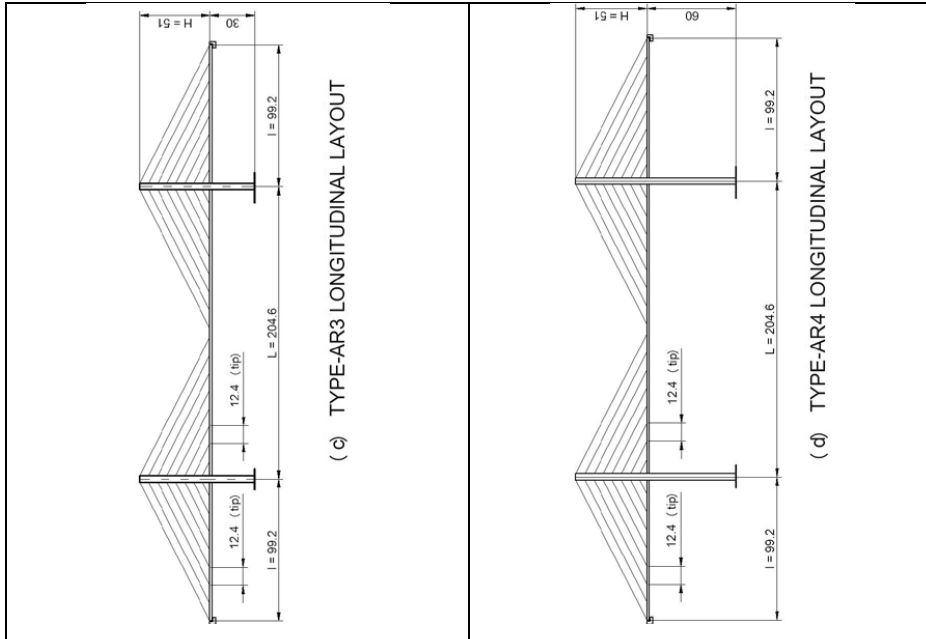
Longitudinal Layouts for Harp Pattern (dimensions in metres)
